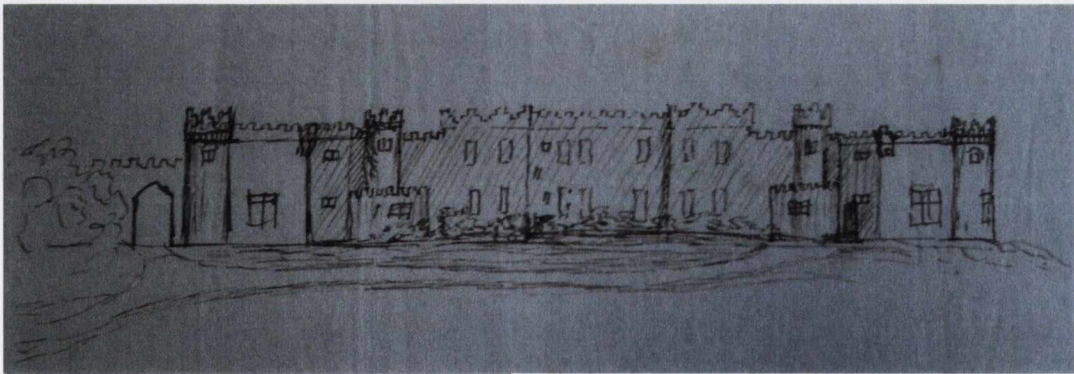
Birr Castle, sketch of proposed north elevation, attrib. to Laurence Parsons, [1801-2], Rosse papers, O/17/5.
